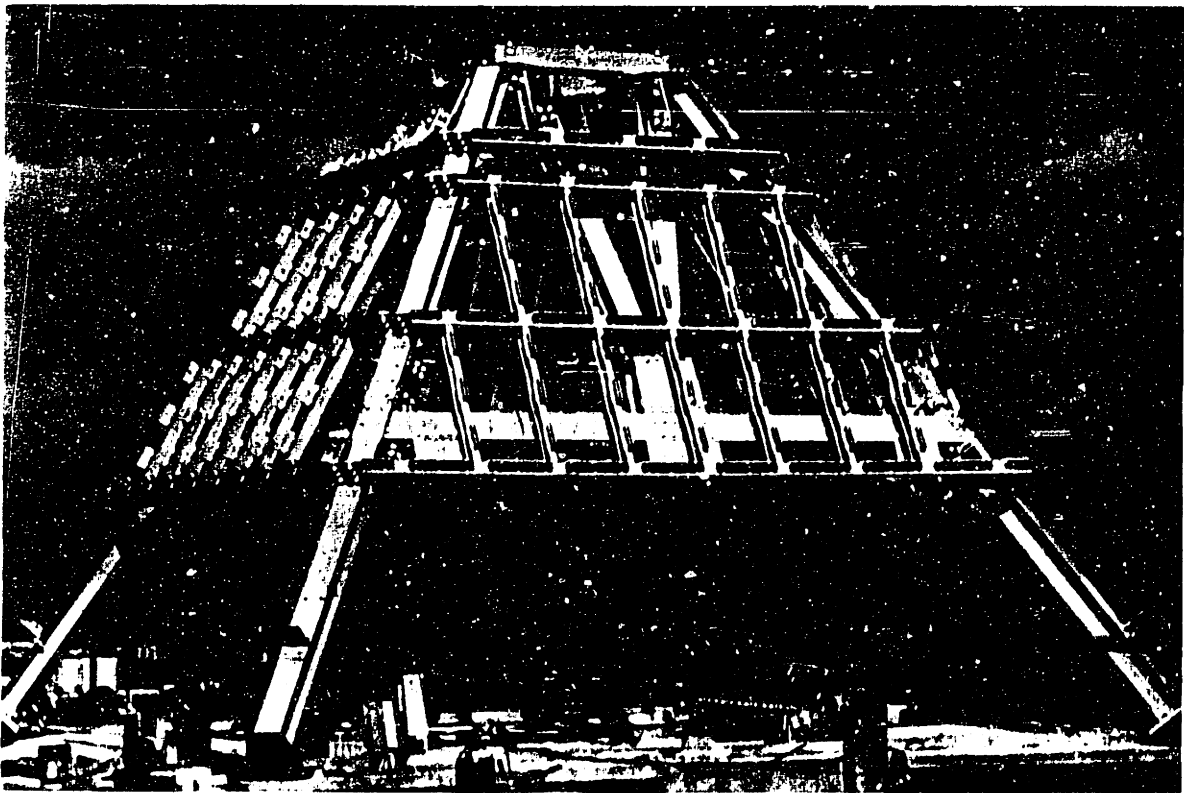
Zinc plating line substructure, Johnstown.
